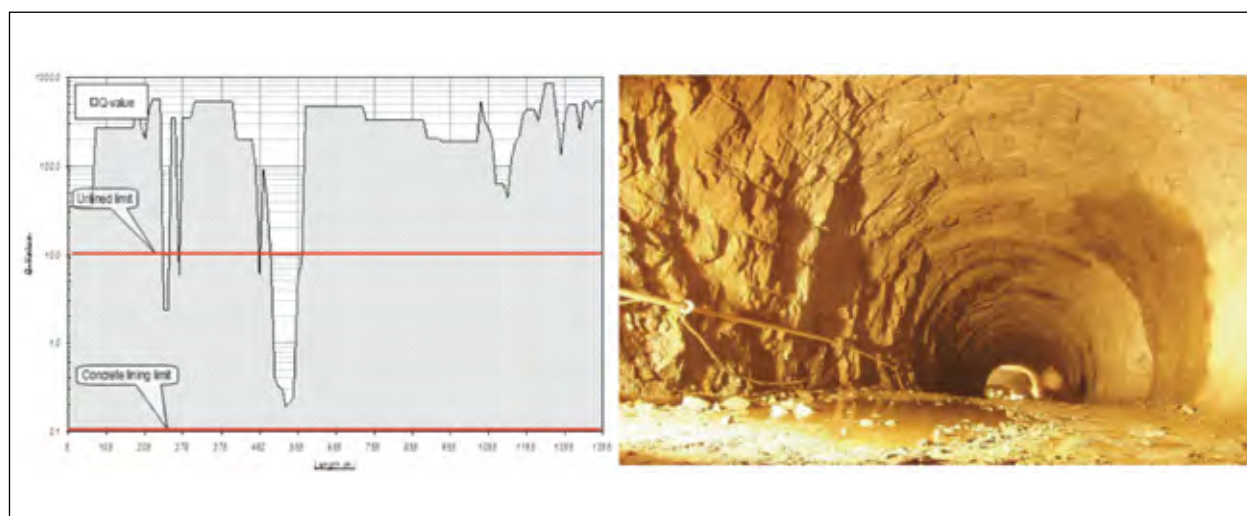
Q -value distribution along the Zahung headrace tunnel and a typical tunnel section with “Extremely Good” rock mass quality.
